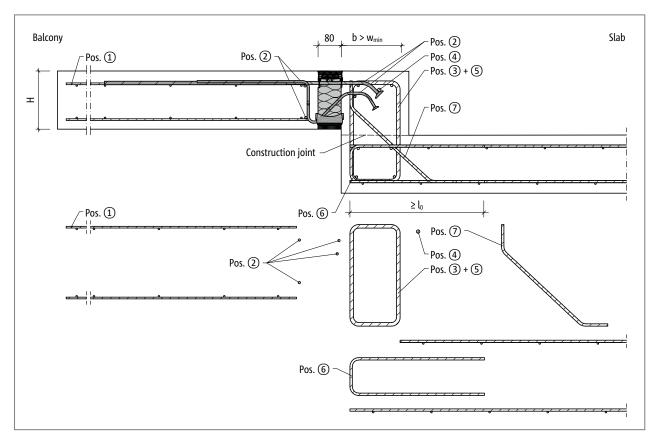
Schöck Isokorb® T type K-O: On-site reinforcement for balcony with height offset upwards with larger structural element dimension (wexist= w_min)
